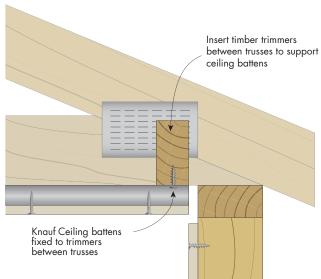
Direct Fix Ceiling to Roof Truss 22mm Cyclonic Batten parrallel to trusses
